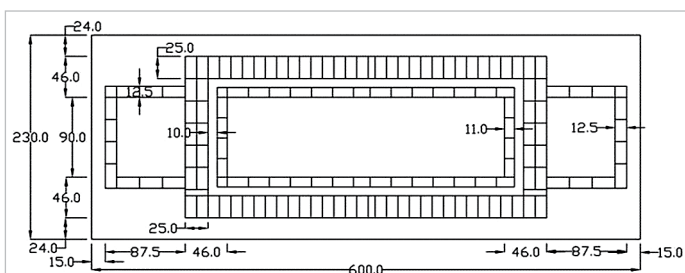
First stage of the oven walls construction from zero level to 40 cm above the concrete base
